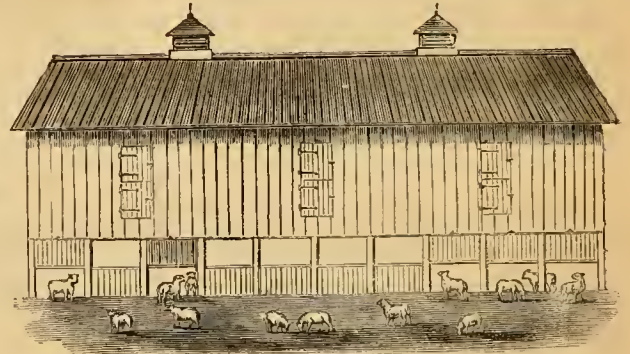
FRONT ELEVATION OF SHEEP-BARN.
